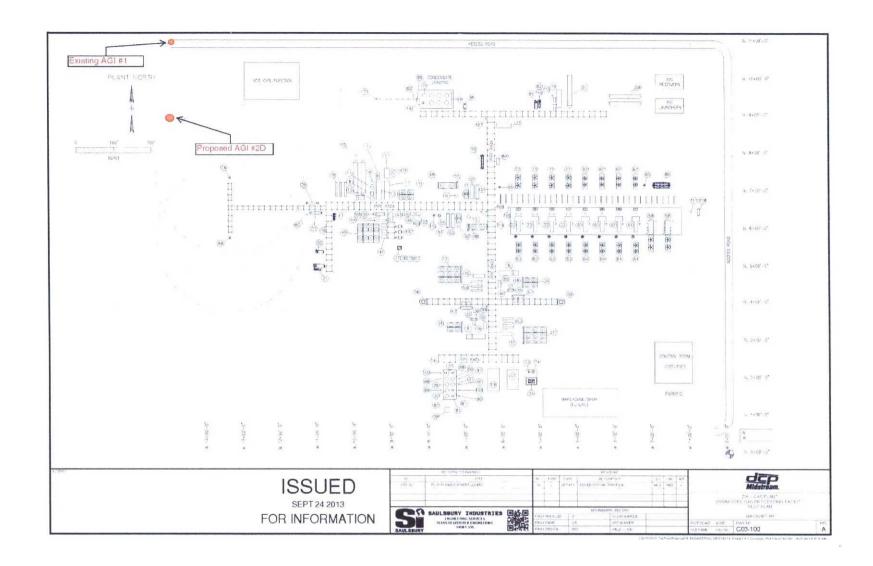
Proposed Location of Zia AGI #2D and Zia Gas Plant Layout
